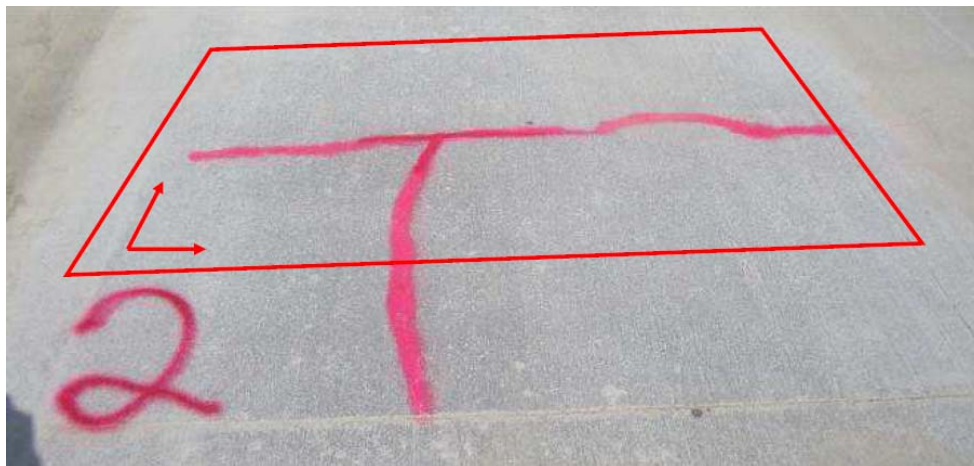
Visible Surface Crack Marked Out in Pink Paint
